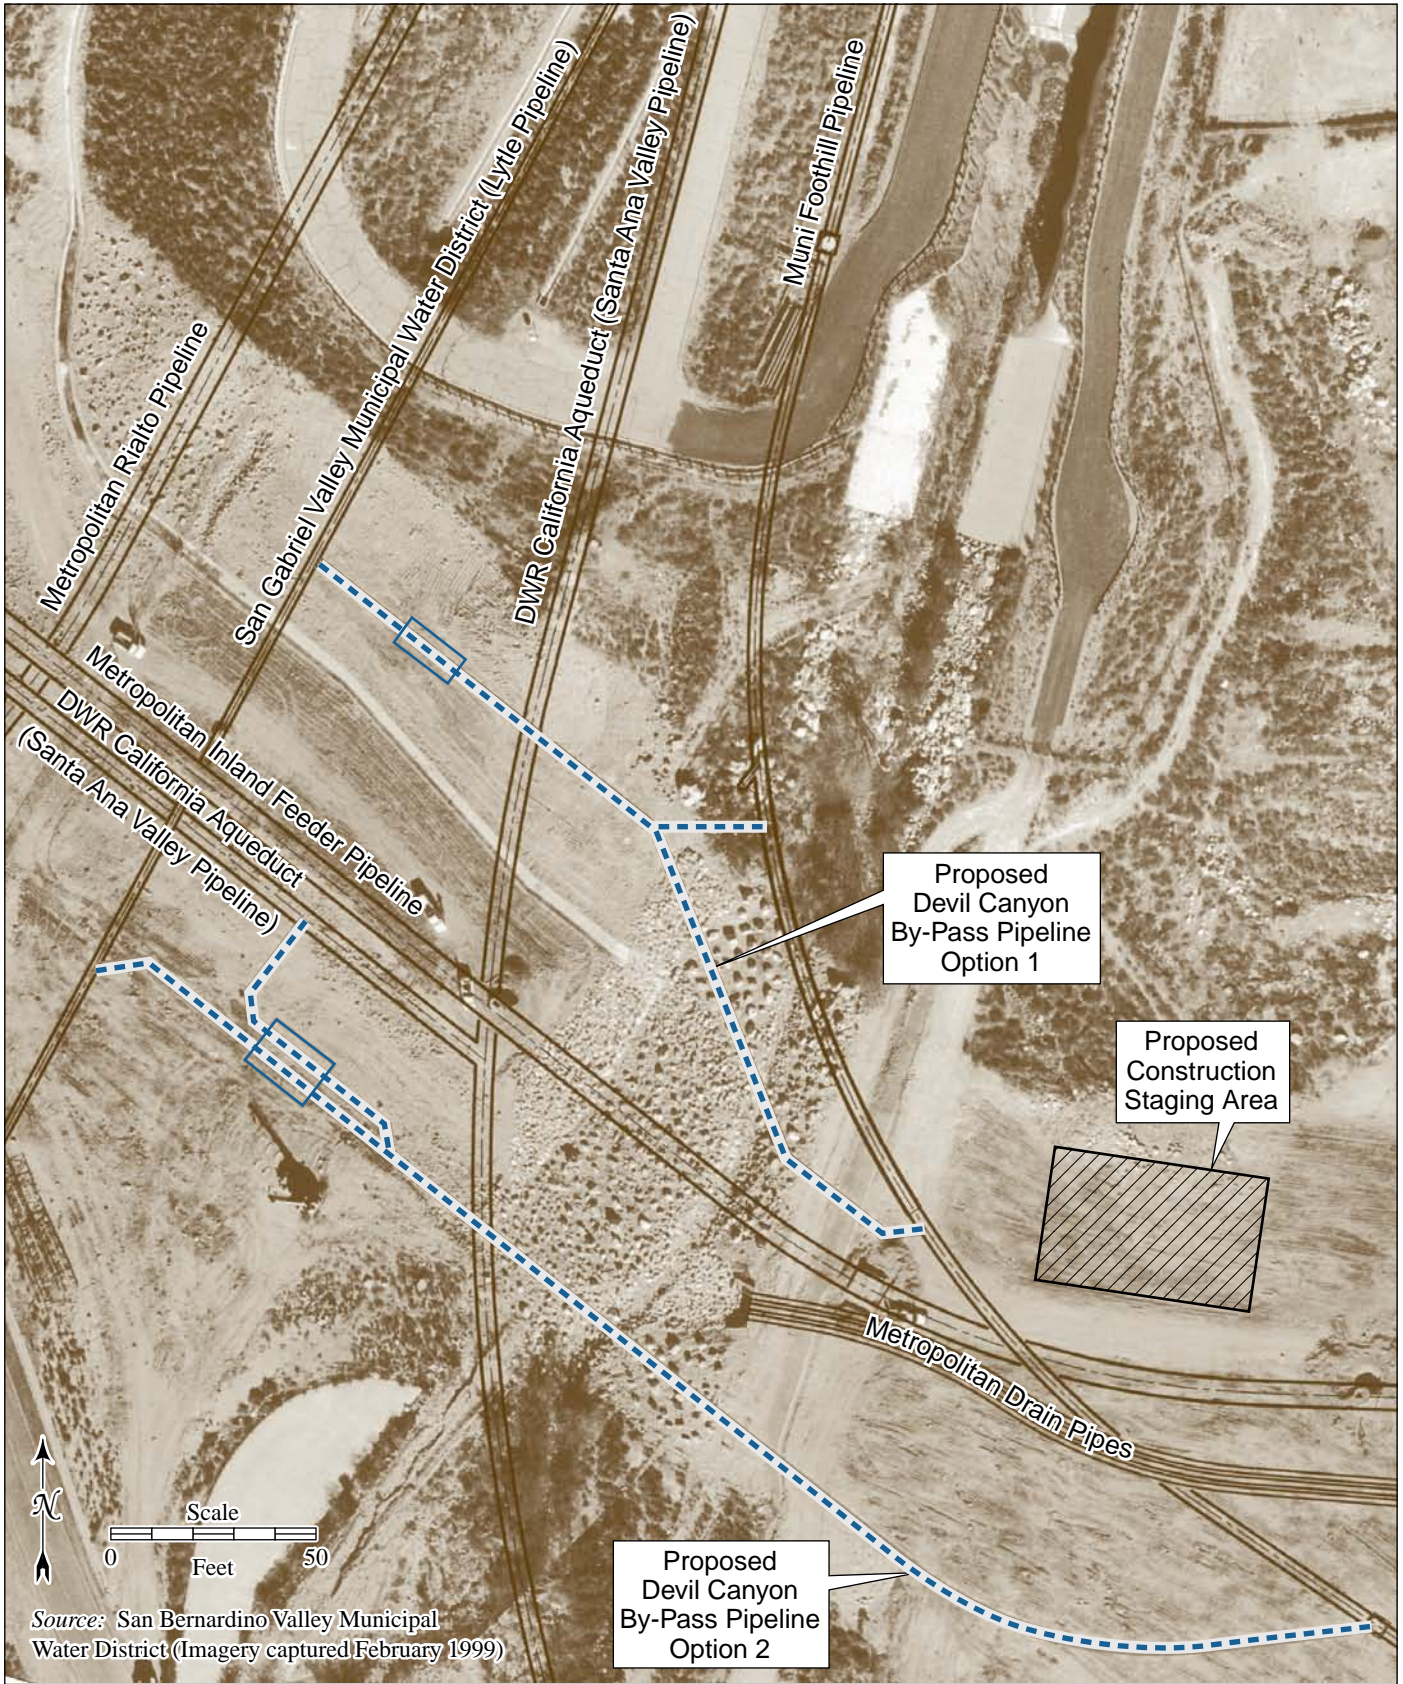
Proposed Project Facilities in Devil Canyon Construction Area
